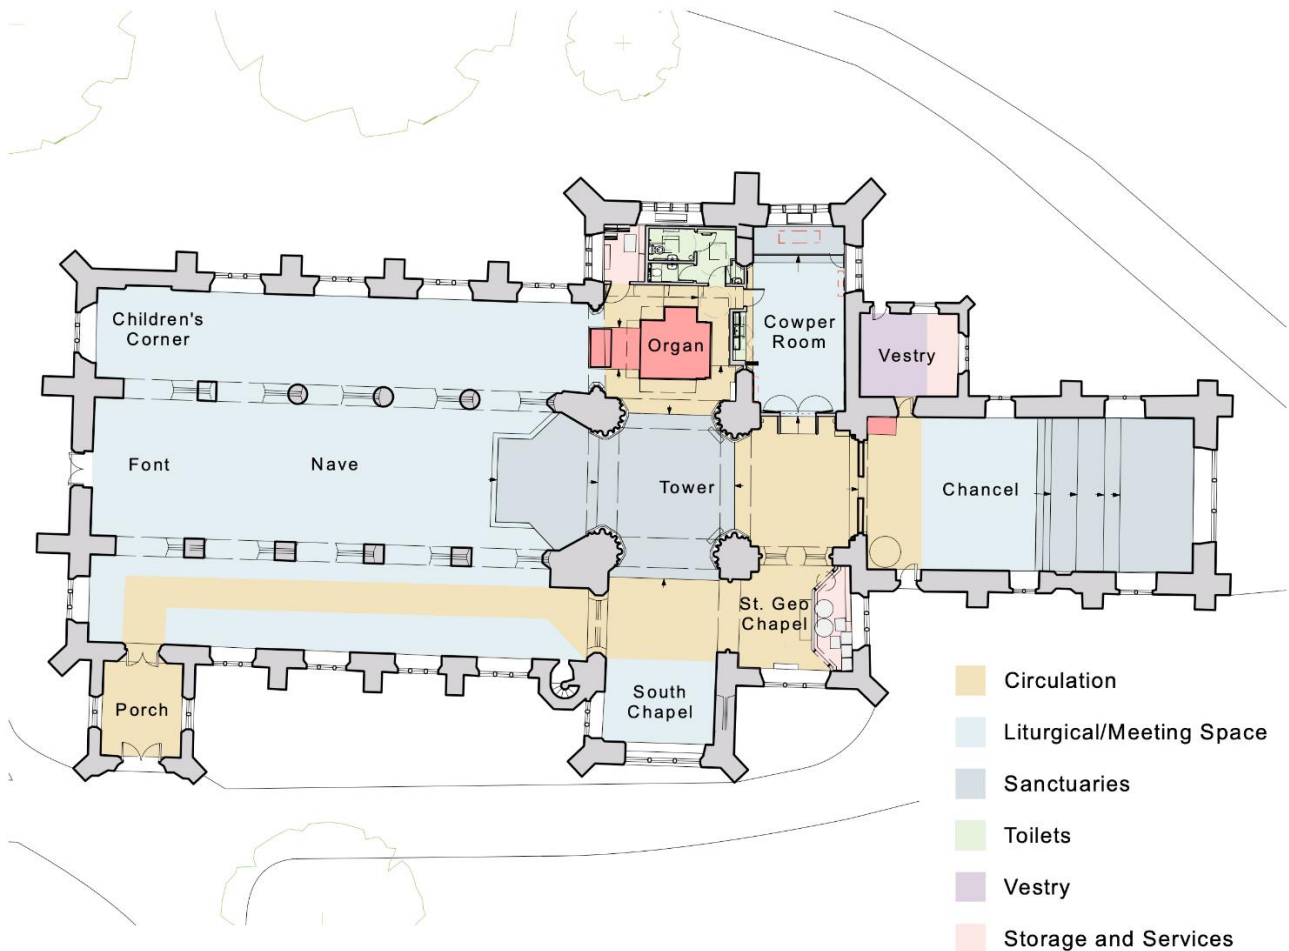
Plan of St Nicholas' Church showing suggested use of spaces
